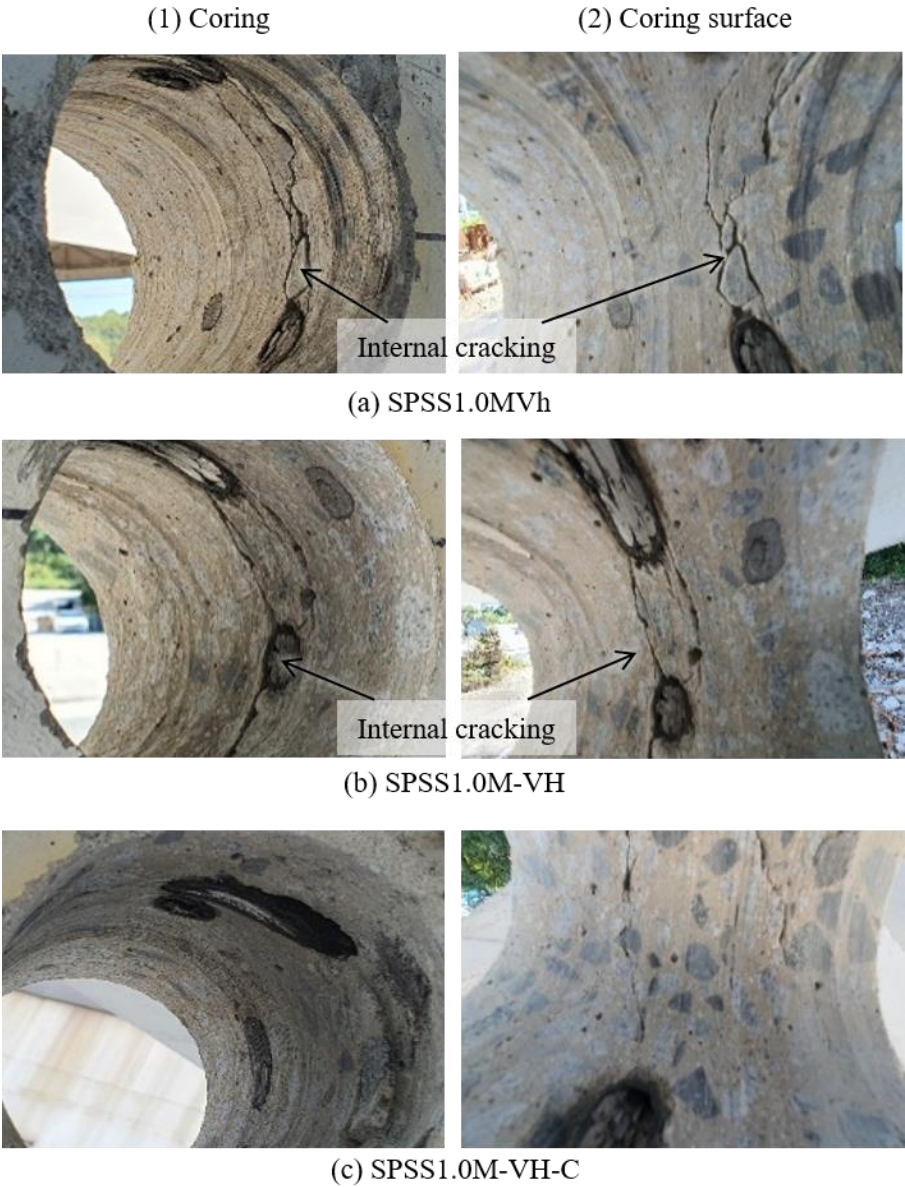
Internal cracks due to horizontal post-tensioning in semi-cylindrical specimens
